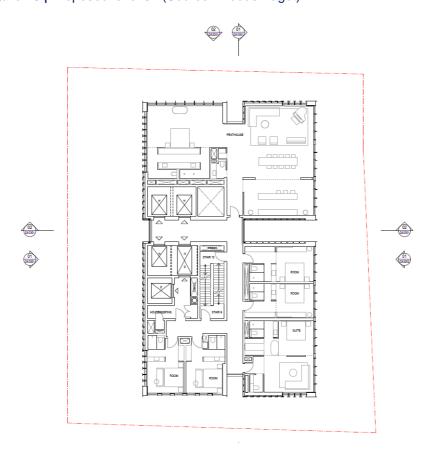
| Proposed level 55 (Source: Woods Bagot)
